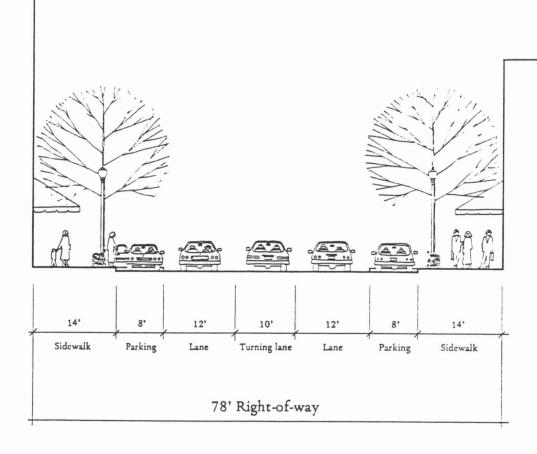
Sherman Avenue - Sidewalk and Lane Widths
